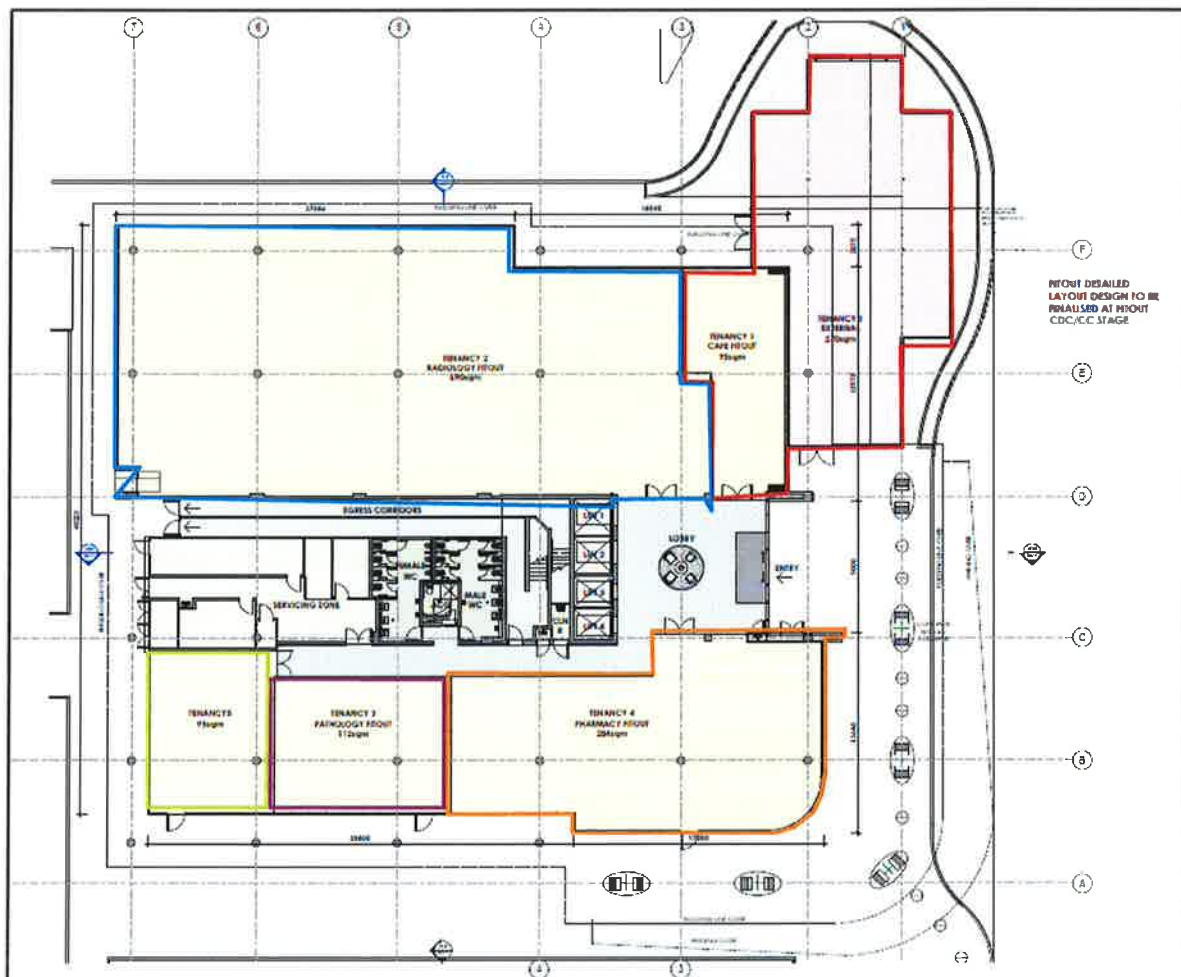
| Altered tenancy arrangements (Source: Application documents)
